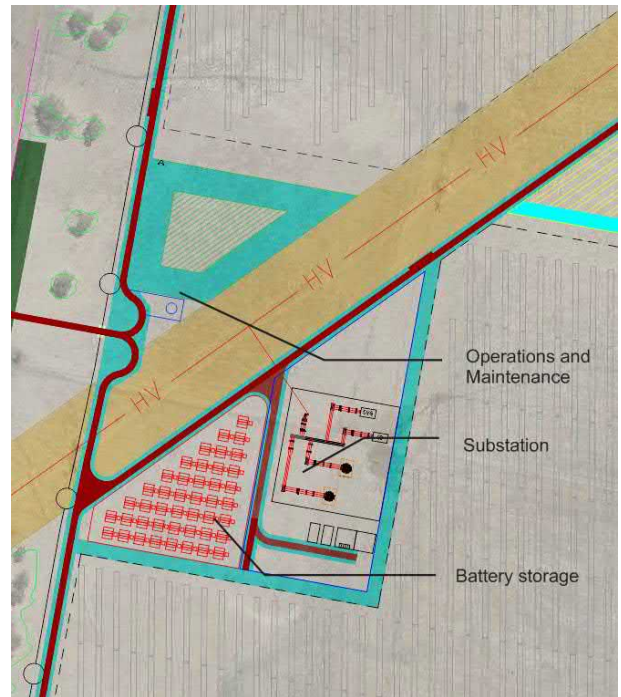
New Proposal: substation, battery storage, operational buildings. Source NG Electrical (Plans dated 29.05.2020) Modified to show ancillary area (Jacobs)
